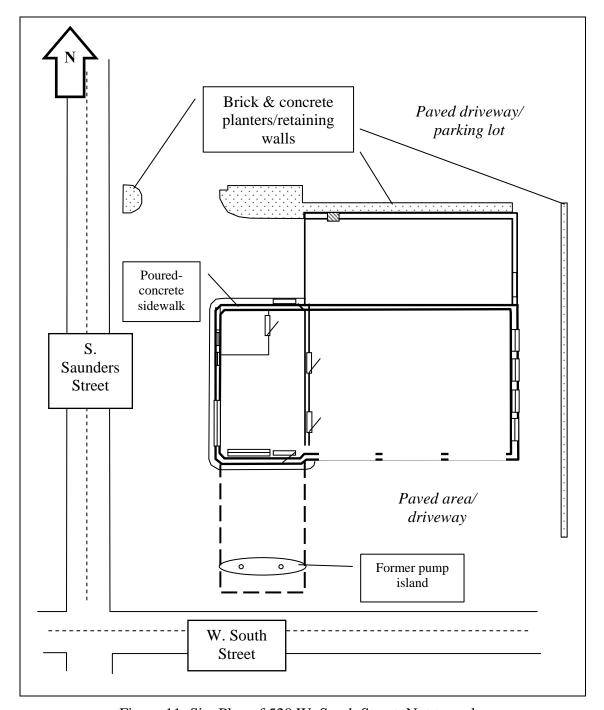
Site Plan of 520 W. South Street. Not to scale.
